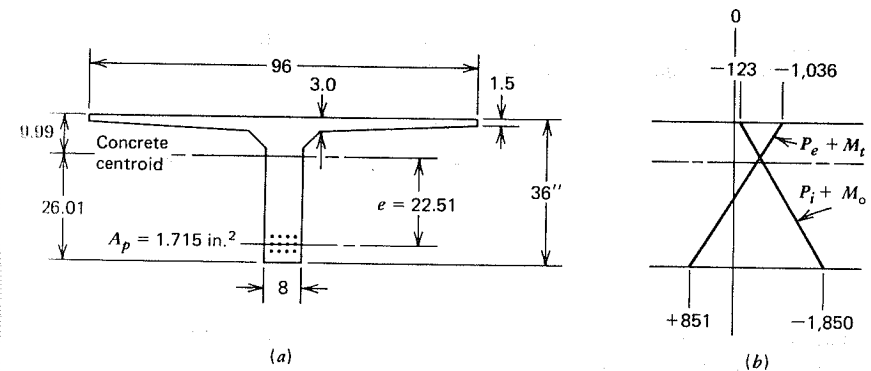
Example of design using standard single-T section beam. (a) Beam cross section. (b) Stresses at midspan.
